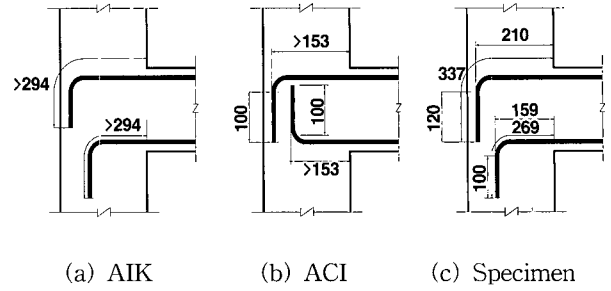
Comparison of provisions on anchorage (unit : mm)
